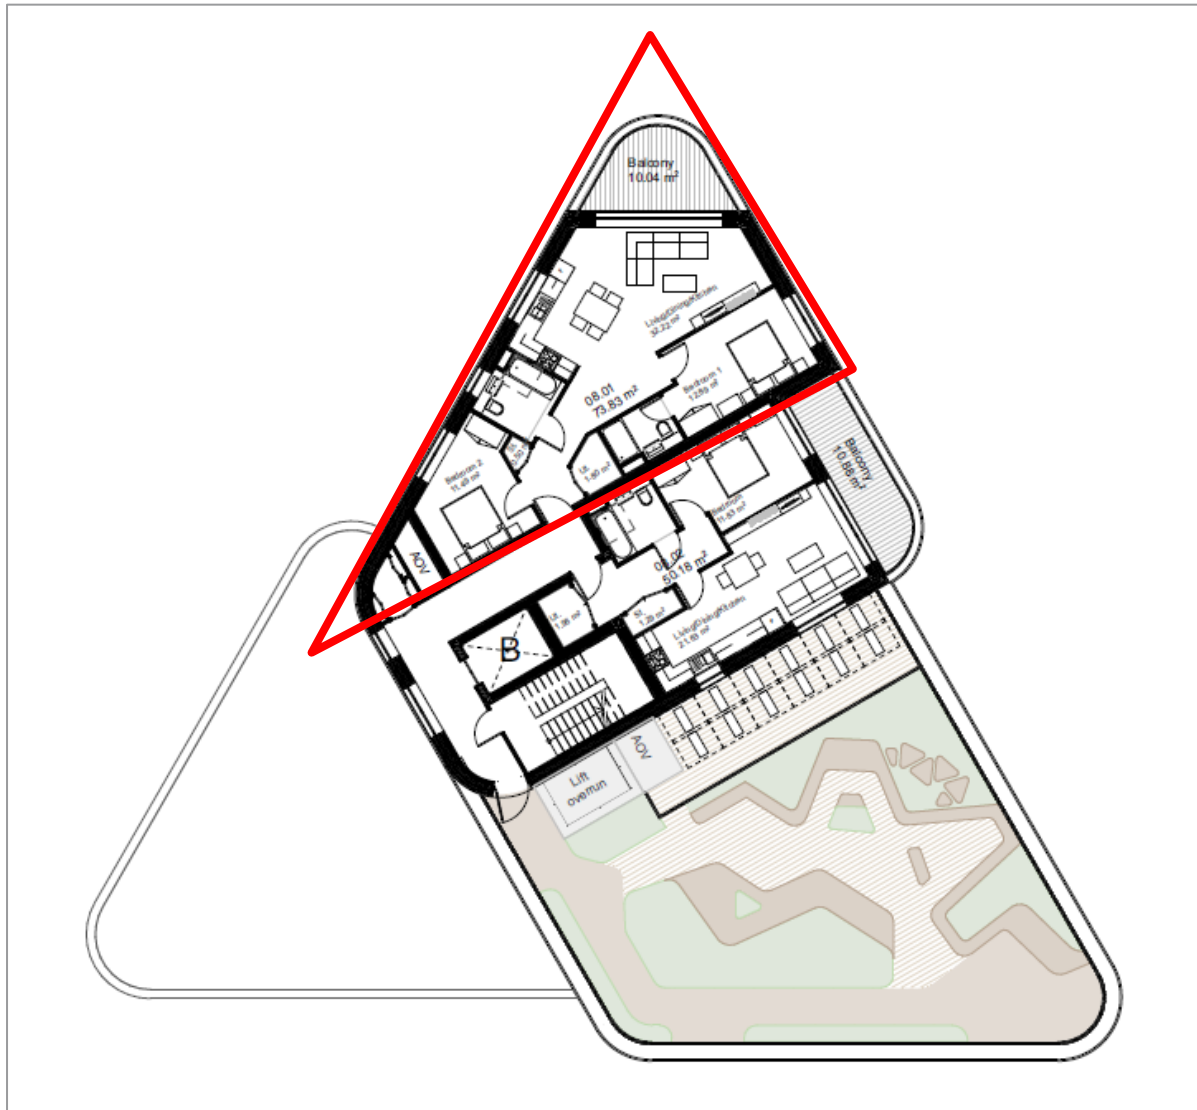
8th floor plan, B.08.01 mid-floor dual-aspect north facing 2bed apartment, Medium noise risk category
